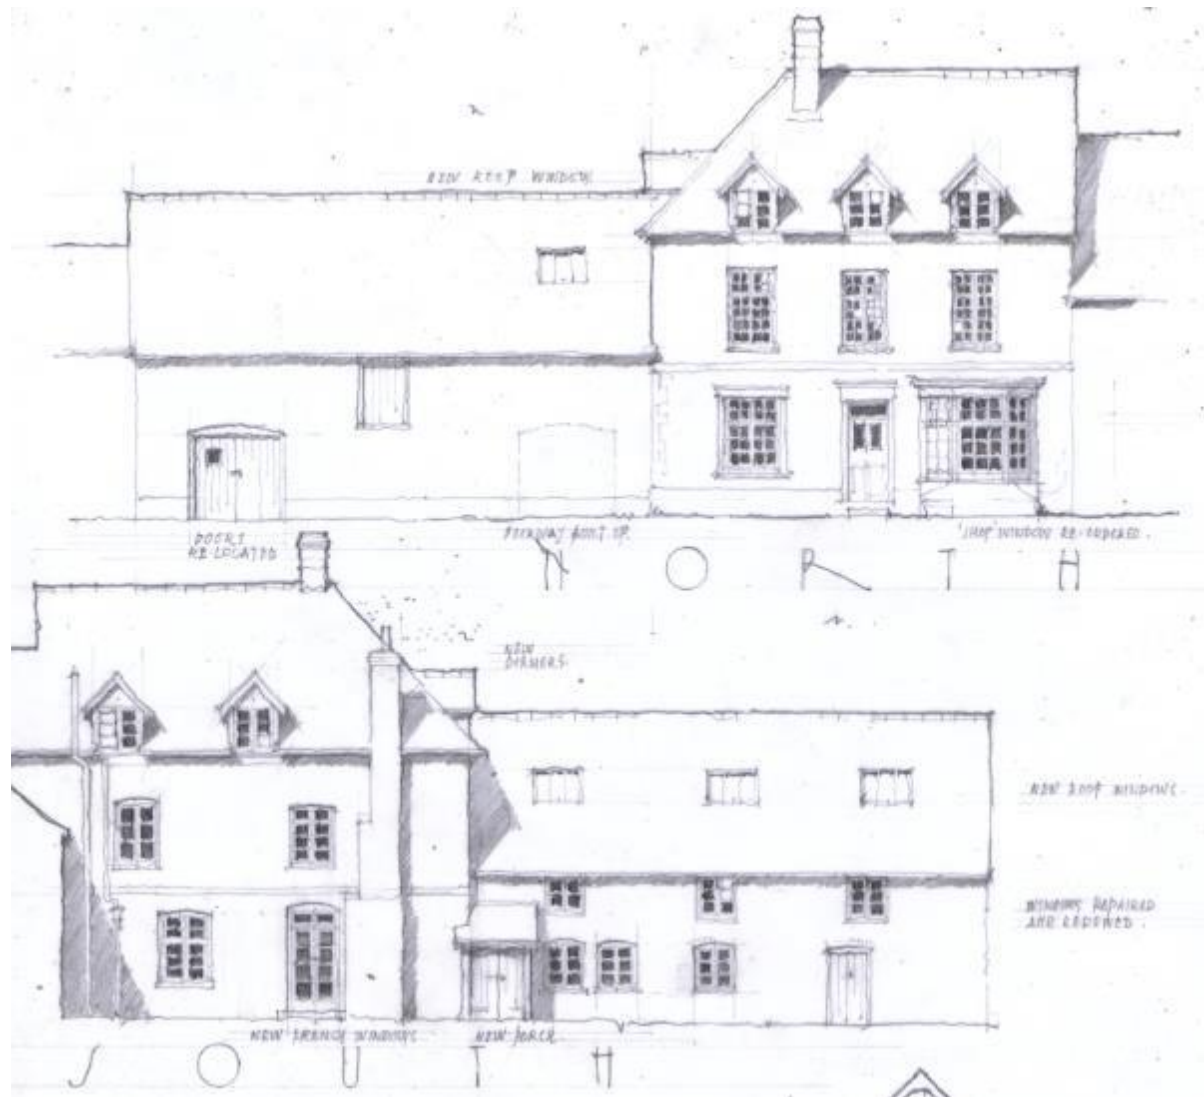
North and South Elevation Plans approved pursuant to P184664/F and P184665/L
